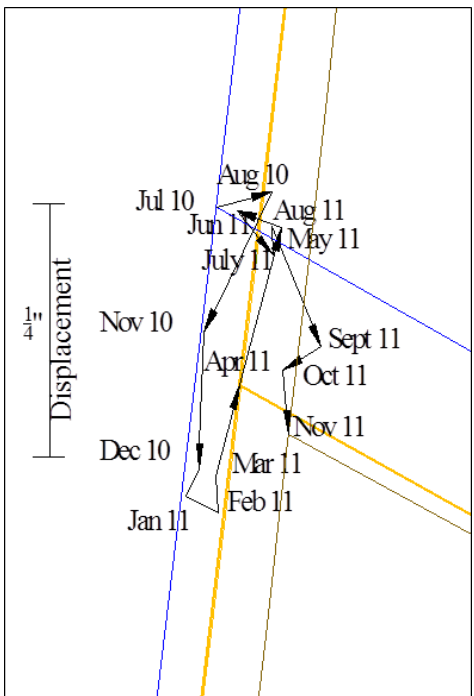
Bridge 2308 movement at north pier west and east reflectors
